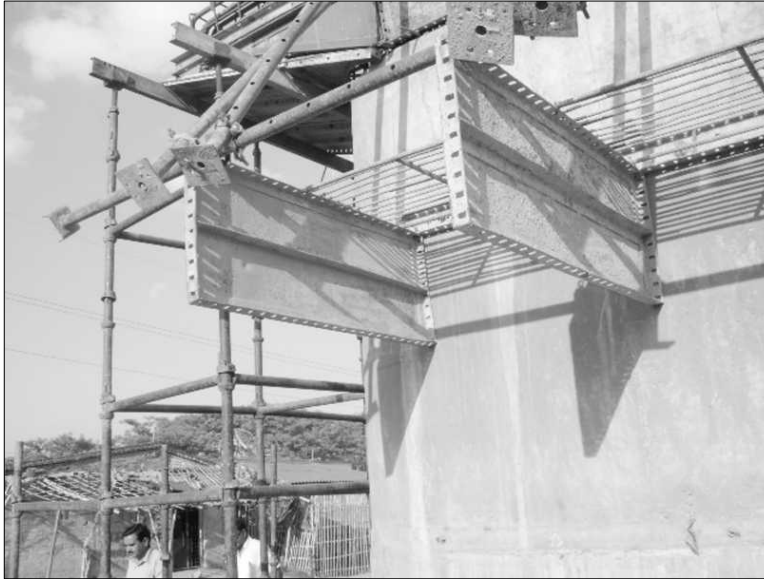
Shuttering Plates Being Used to Form Brackets to Support Working Platform.
